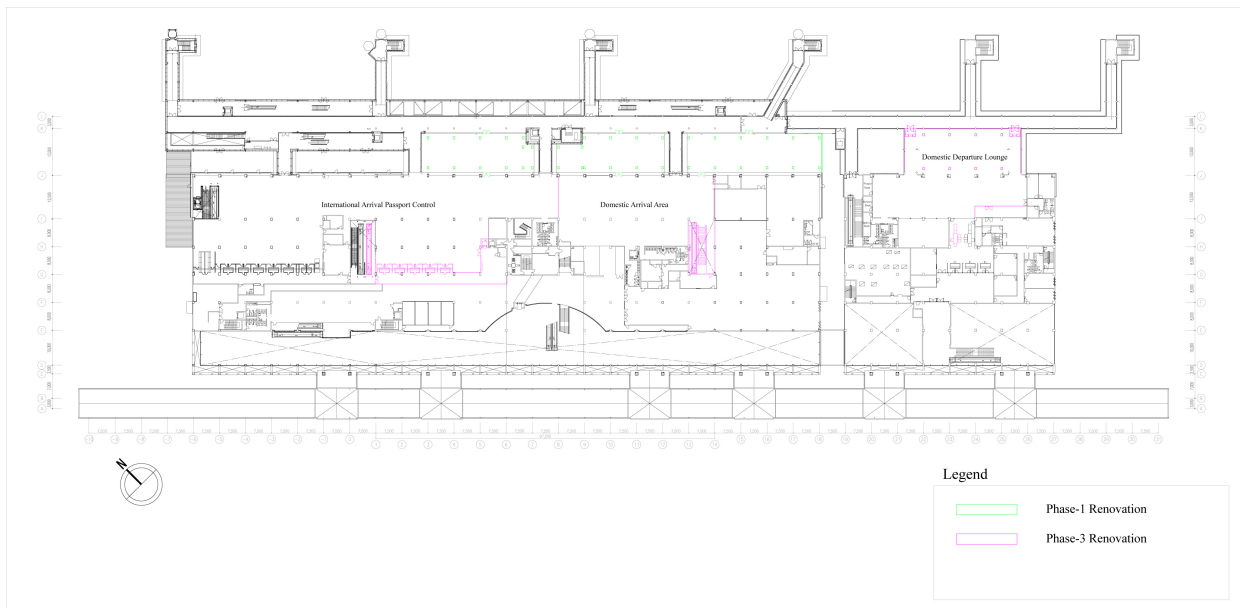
Phase-3 Renovation Plan of Passenger Terminal Building (2nd Floor)
